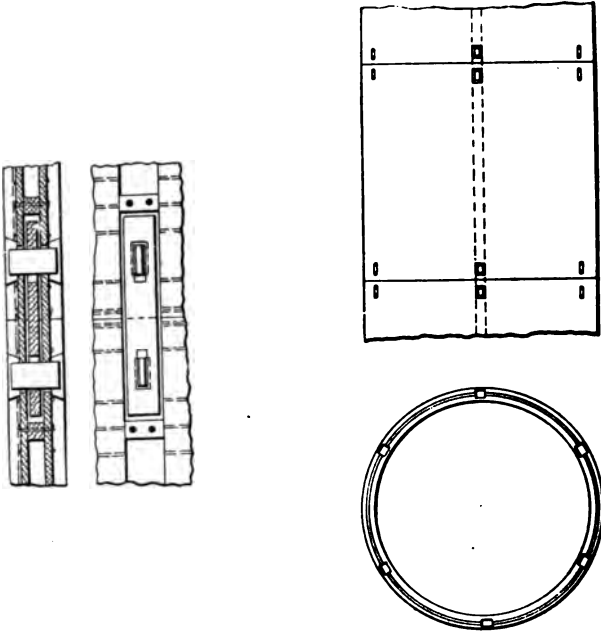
Reinforced Concrete Cylinder Foundation, Cockle Creek Bridge, New South Wales.
